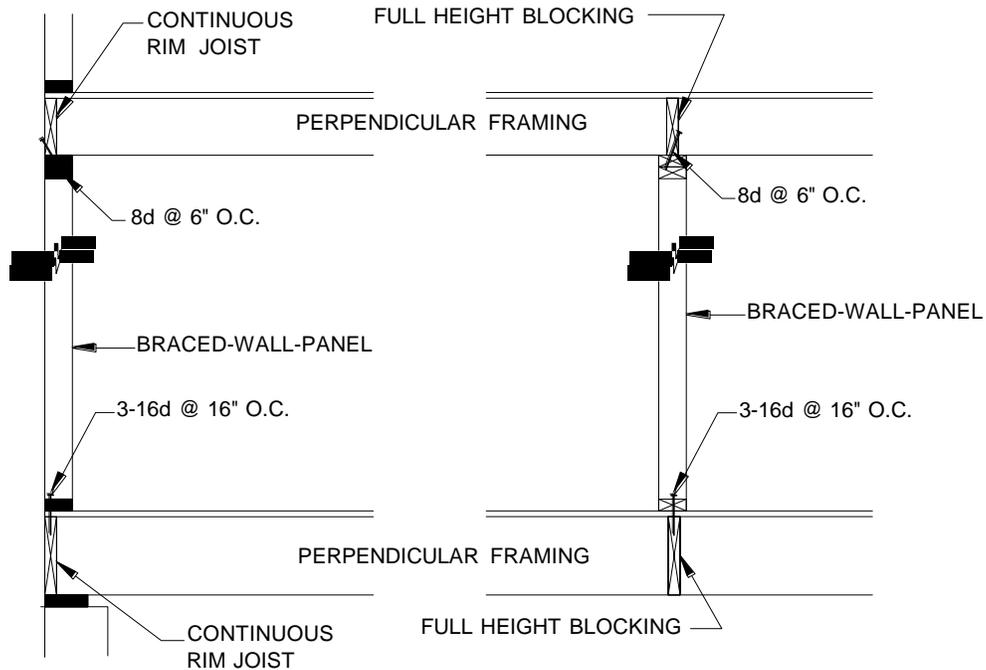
BRACED-WALL-PANEL CONNECTION WHEN PERPENDICULAR TO FLOOR/CEILING FRAMING
